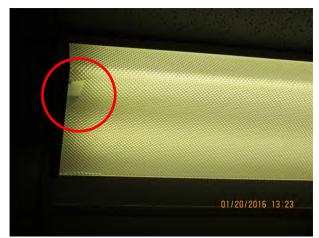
Crack in lens of 1'x4' fluorescent luminaire in the boys washroom
